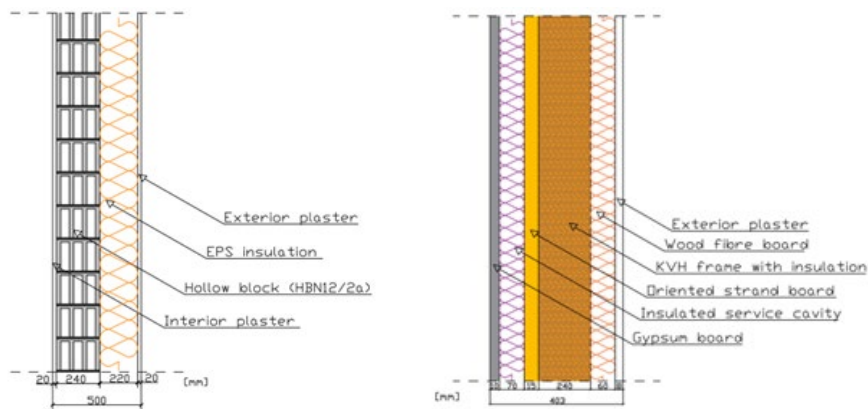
Section view of the external wall of the concrete (left) and the timber (right) building.
